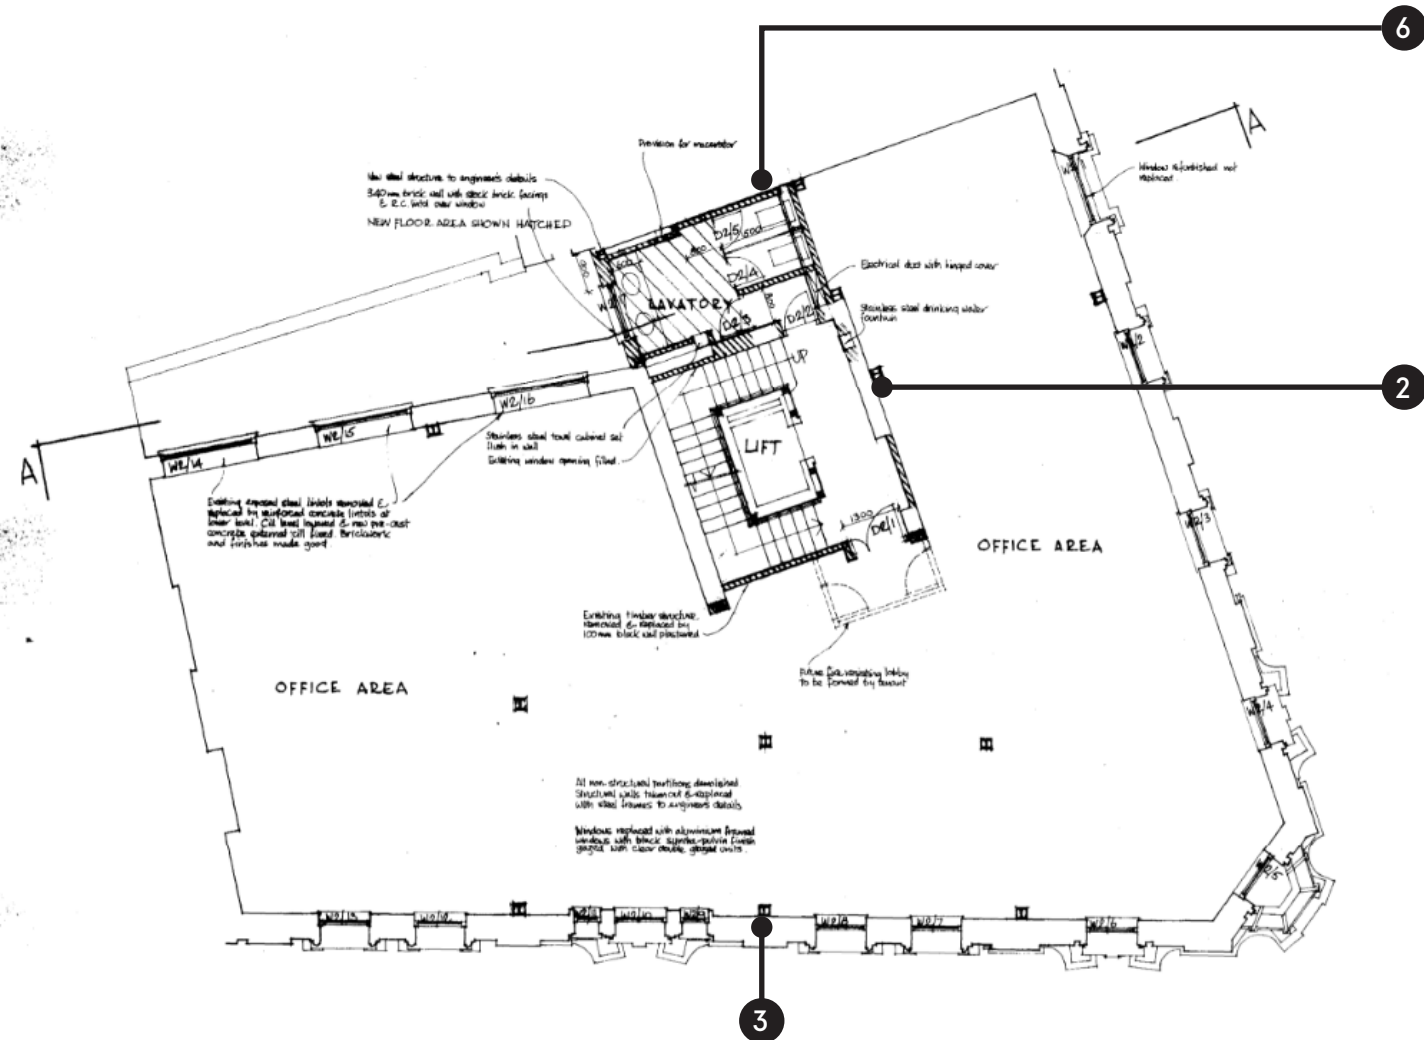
ARCHIVE PLAN DRAWING, TYPICAL UPPER FLOOR, 1983
